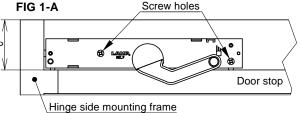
A: Line up the LDD-S body with the top door stop and hinge side mounting frame. Fix the body with the provided body installation screws
